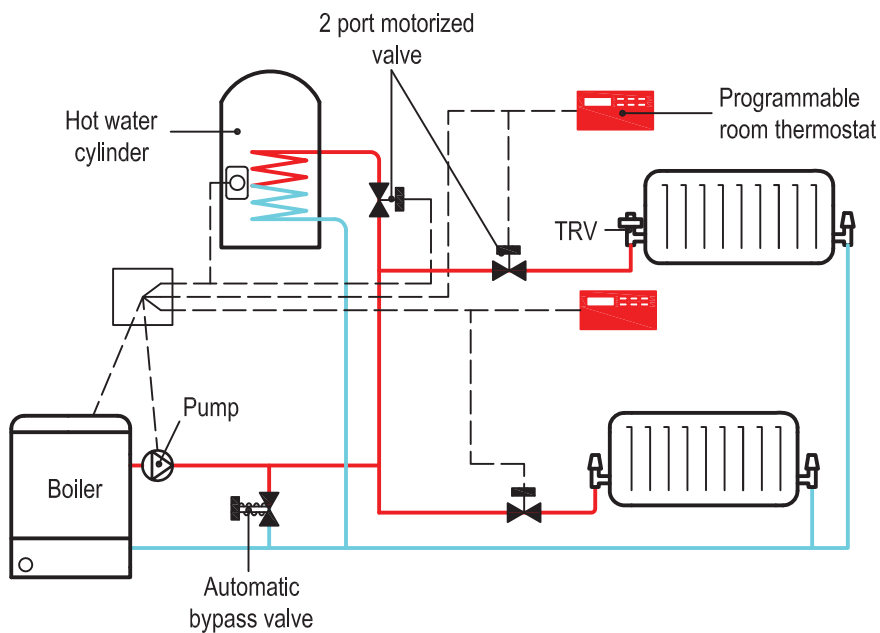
Example of a possible schematic arrangement for gas/oil boiler with two heating zones using three two port motorised valves
